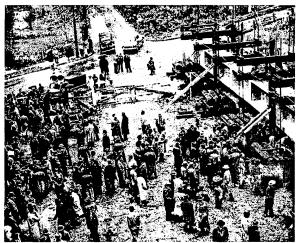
Test to destruction of one beam at Walnut Lane Bridge.
